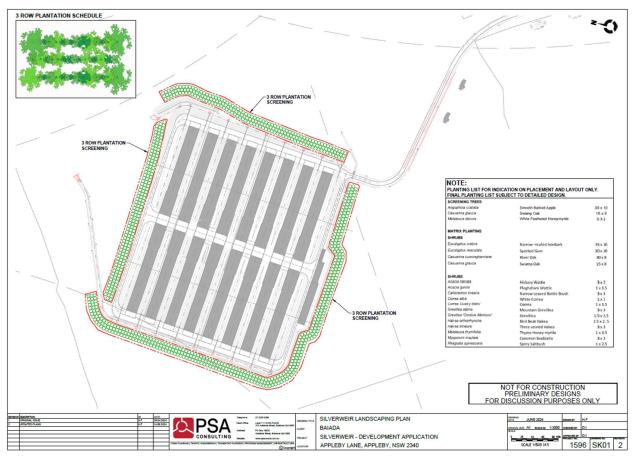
Landscaping Plan (PSA Consulting, 2024)
